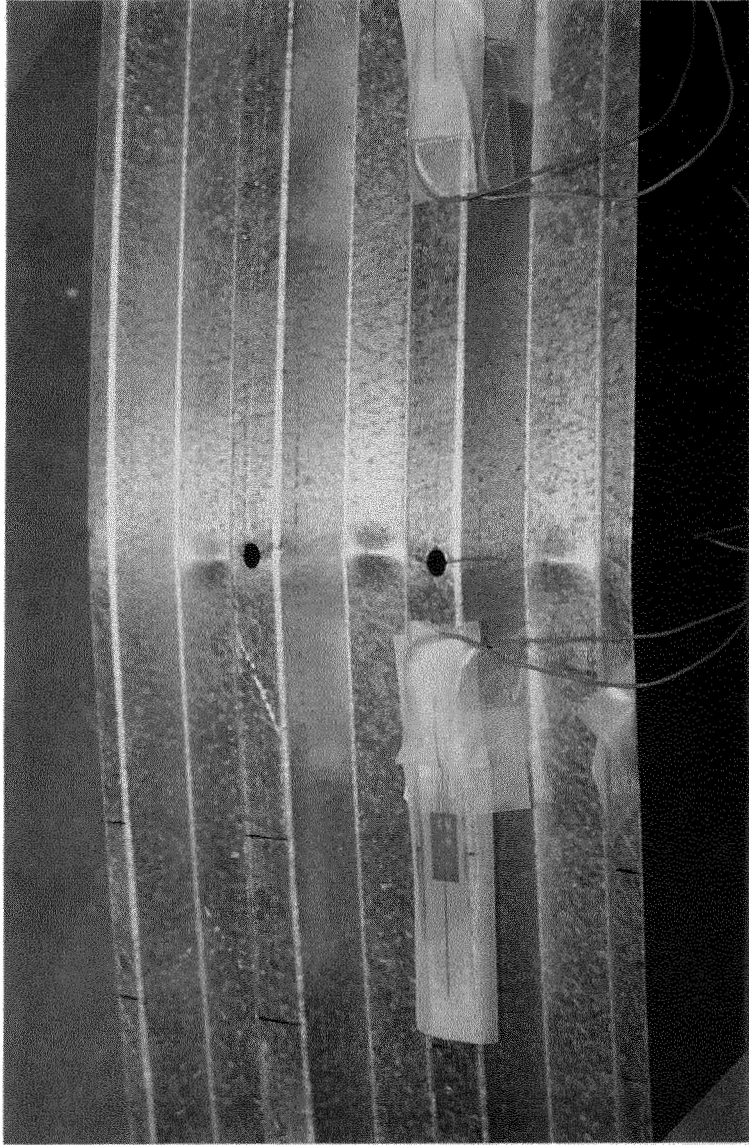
Necking and Fracture Near the Holes in the Panels with Screws (Continued)
